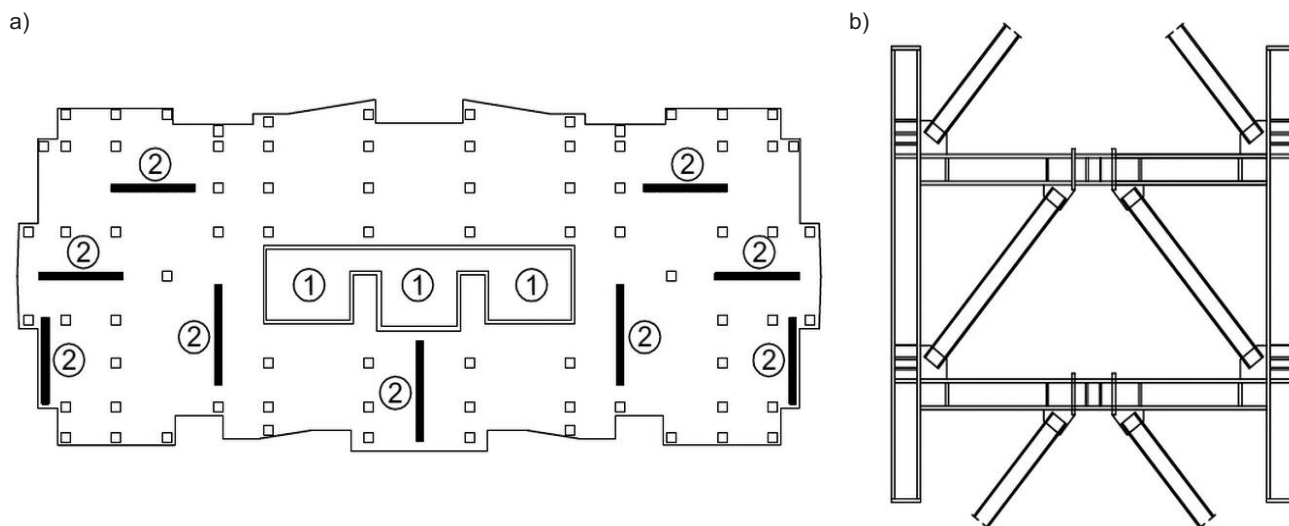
Tallwood 1 building in Canada : a) floor plan: 1 – communication core; 2 – location of steel frames; b) steel frame structure – two-story repeating segment
